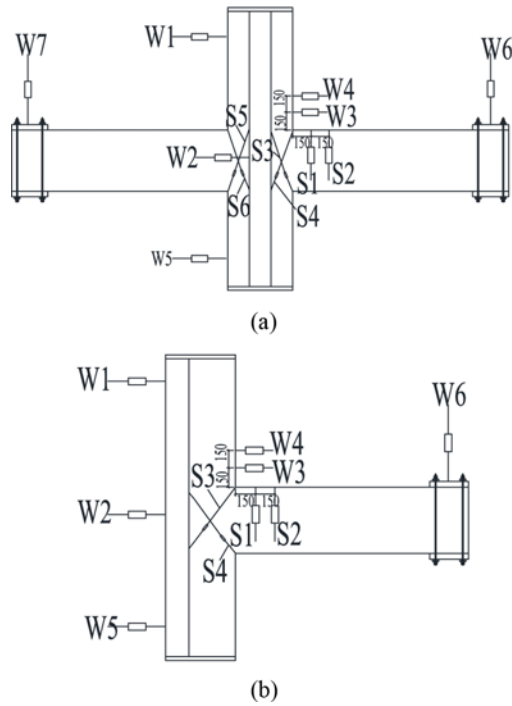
Instrumentation Layout: (a) S+ Specimens, (b) ST and SL Specimens
